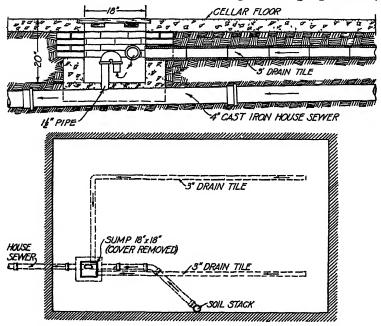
Draining through House Sewer—Rarely Advisable.
